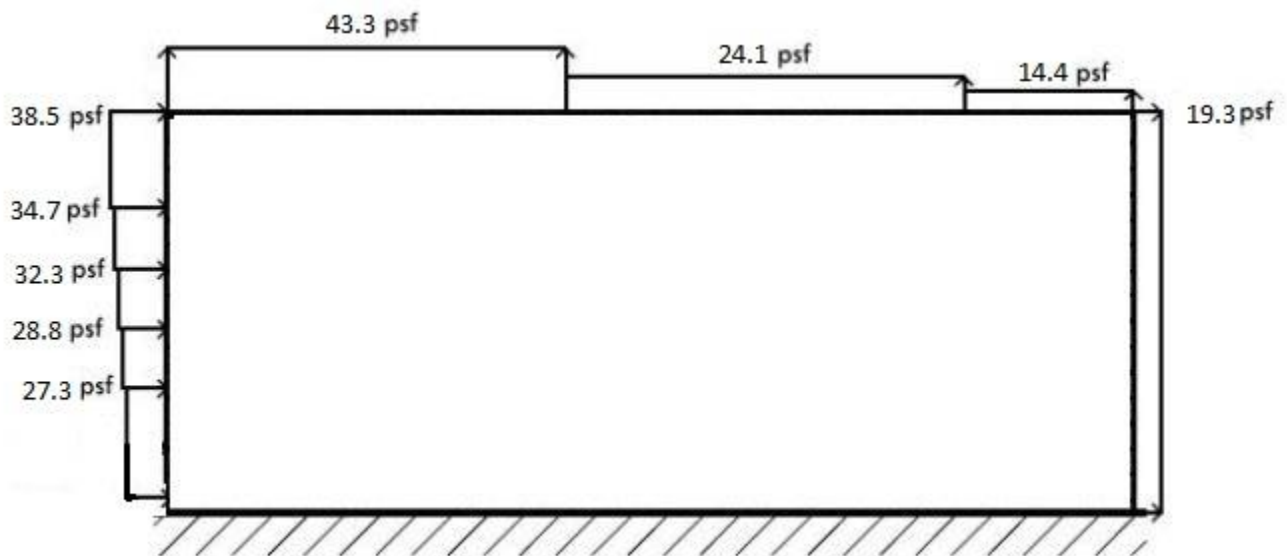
Wind Pressures acting on the East Wing, East and West facades
